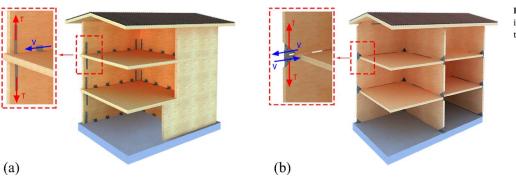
Schematic representation of CLT buildings assembled by using: (a) standard connections; (b) X-RAD connection system.
